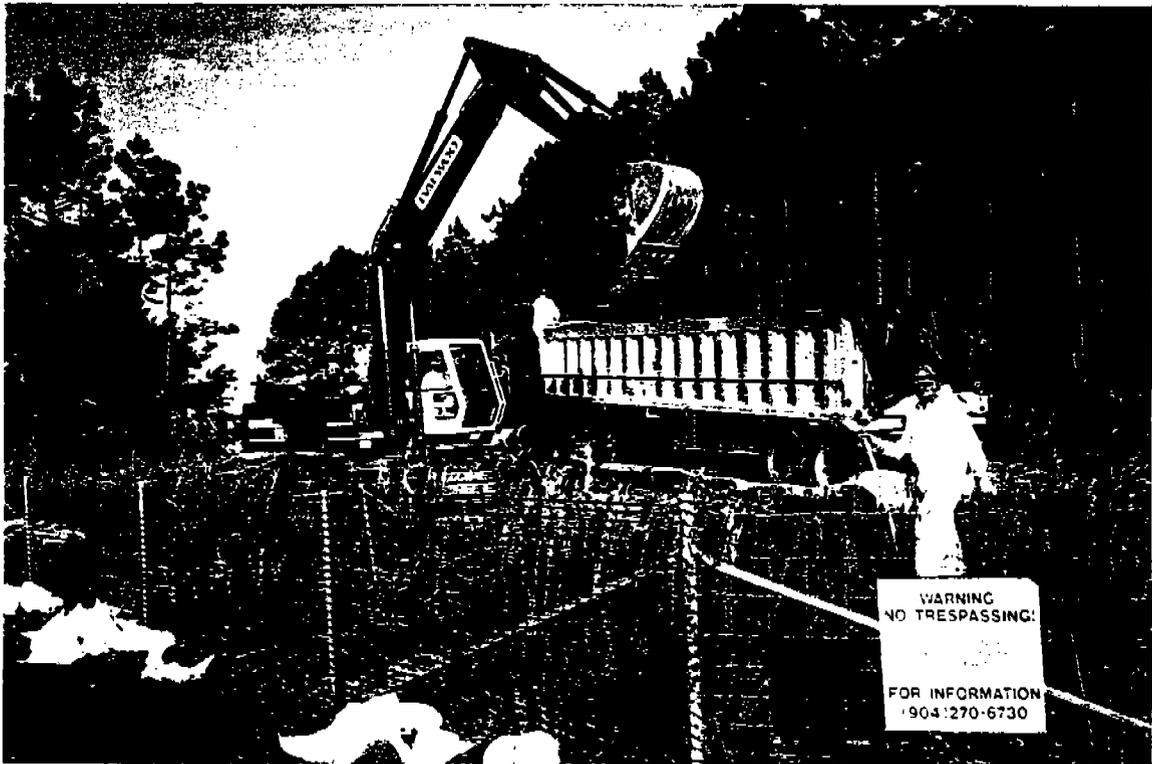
Loading excavated soil into a 20-cubic-yard trailer.
